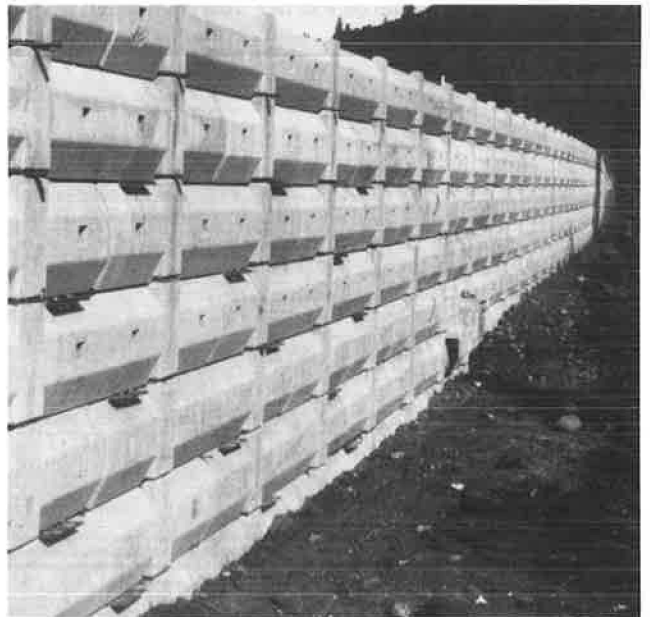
Front face of wall at instrument location 2 (wall 3) with dummy bar-mats extending from face.
